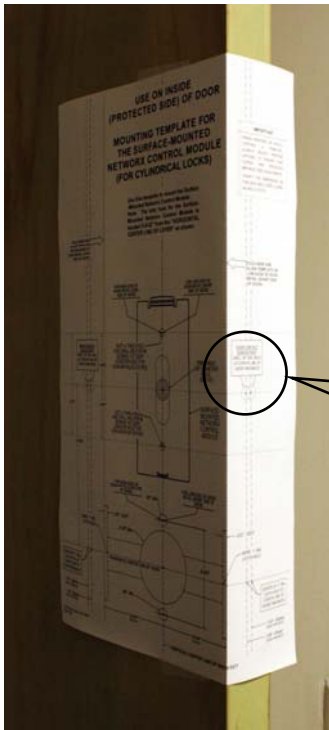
DOOR CONTACT SENSOR HOLE ON DOOR EDGE
